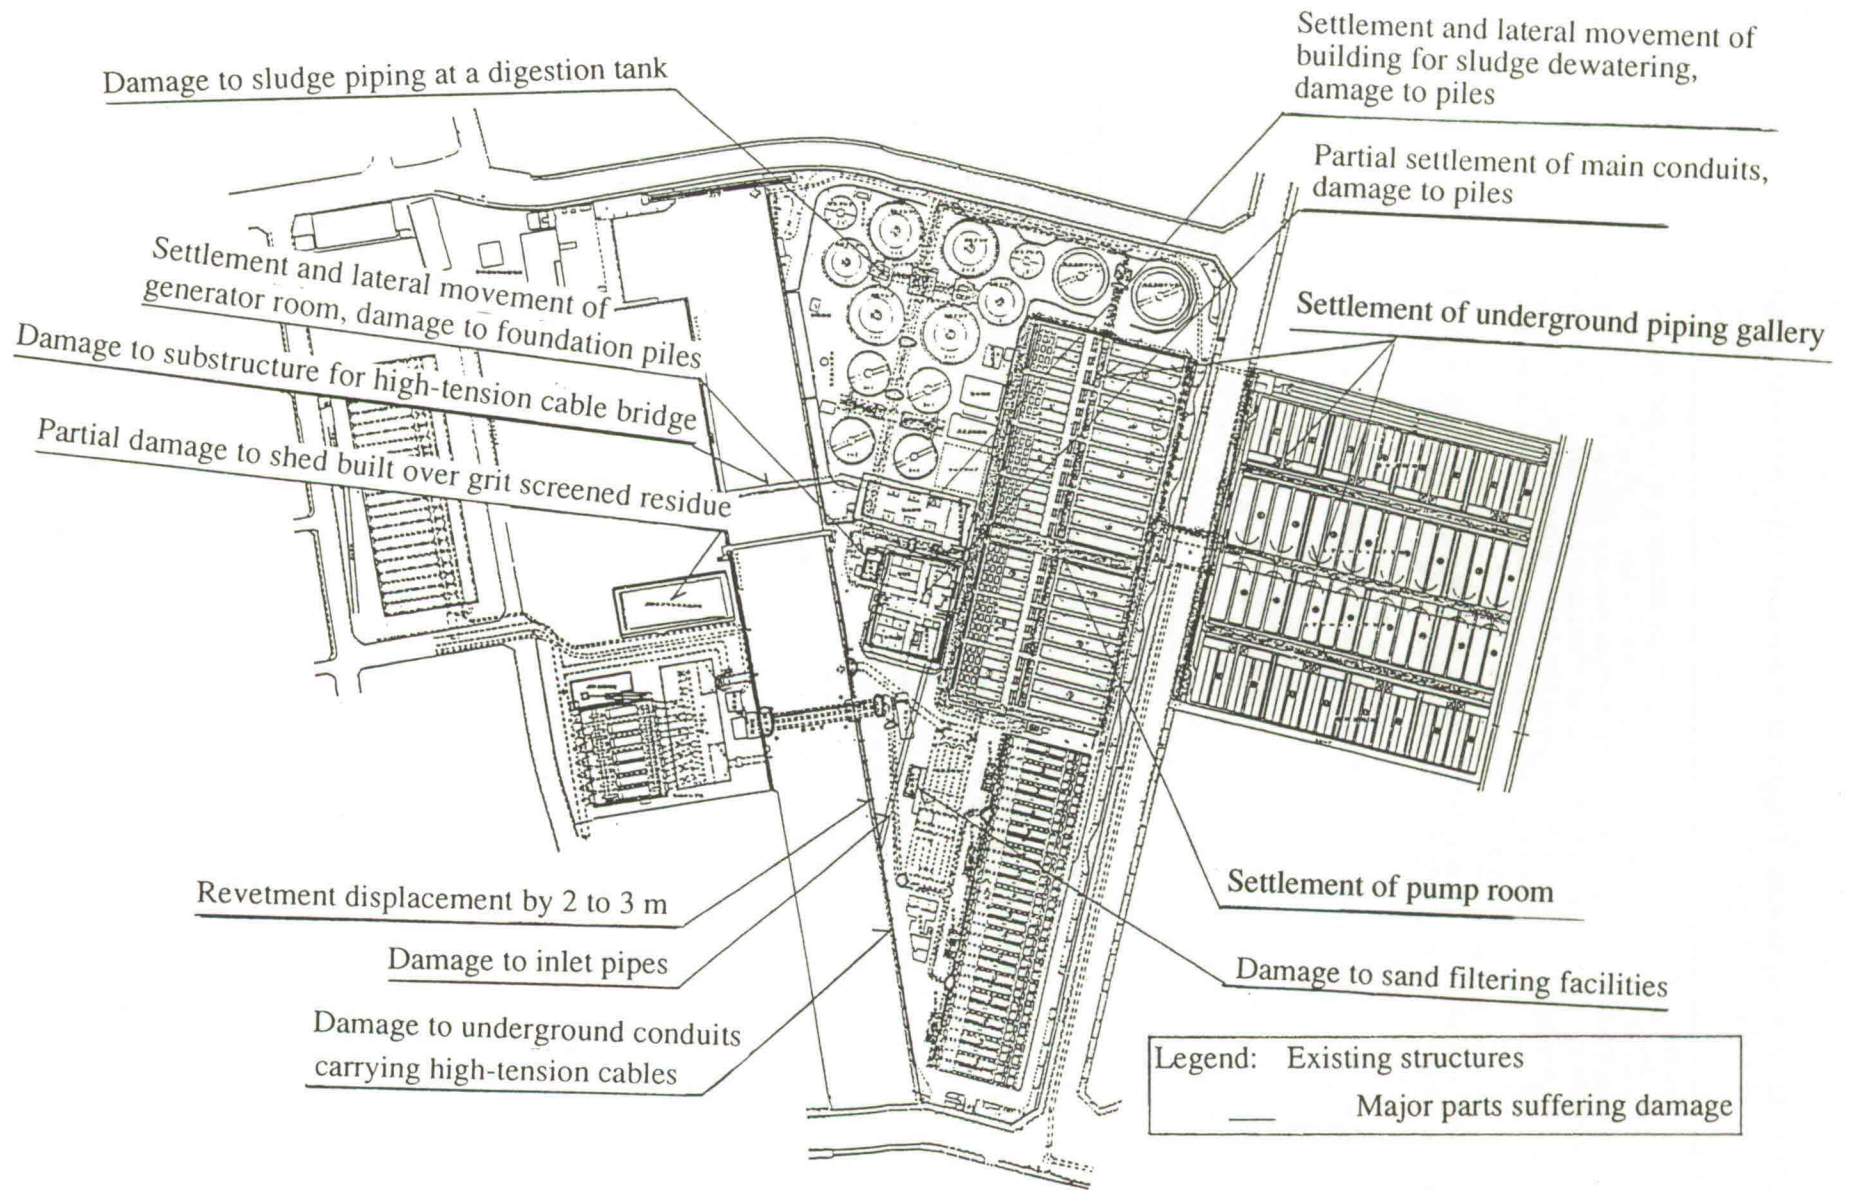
Plan view of Higashi-Nada Sewage Treatment Plant
